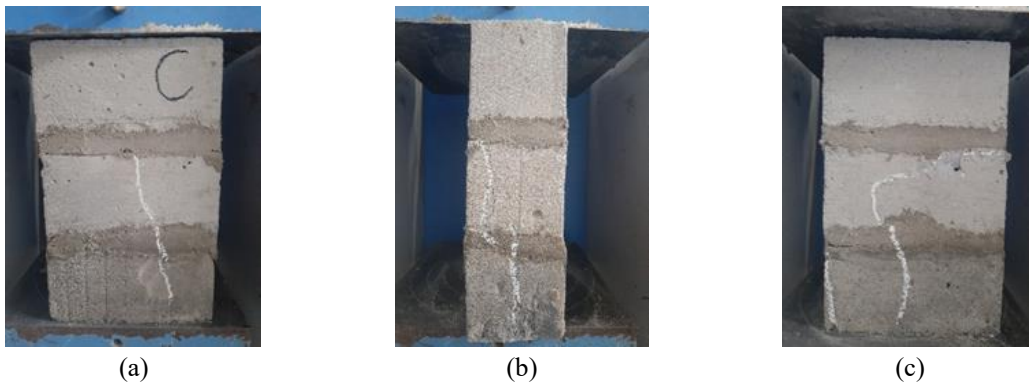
Failure pattern of control specimen (a) Diagonal crack at face of specimen, (b) Vertical cracks along width of specimen and (c) Vertical cracks along with cracks along bed joint
